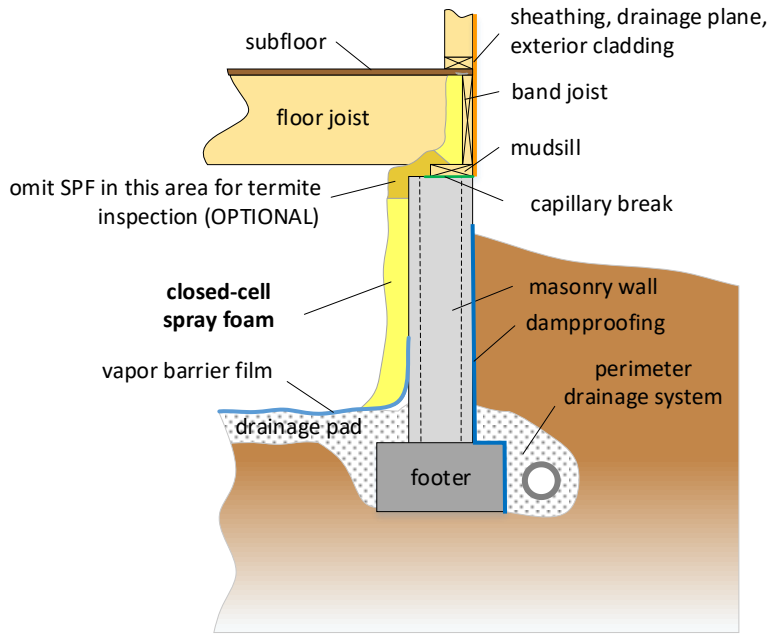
Fully-Adhered SPF to Dry Masonry/Concrete Crawlspace Wall (diagram)
